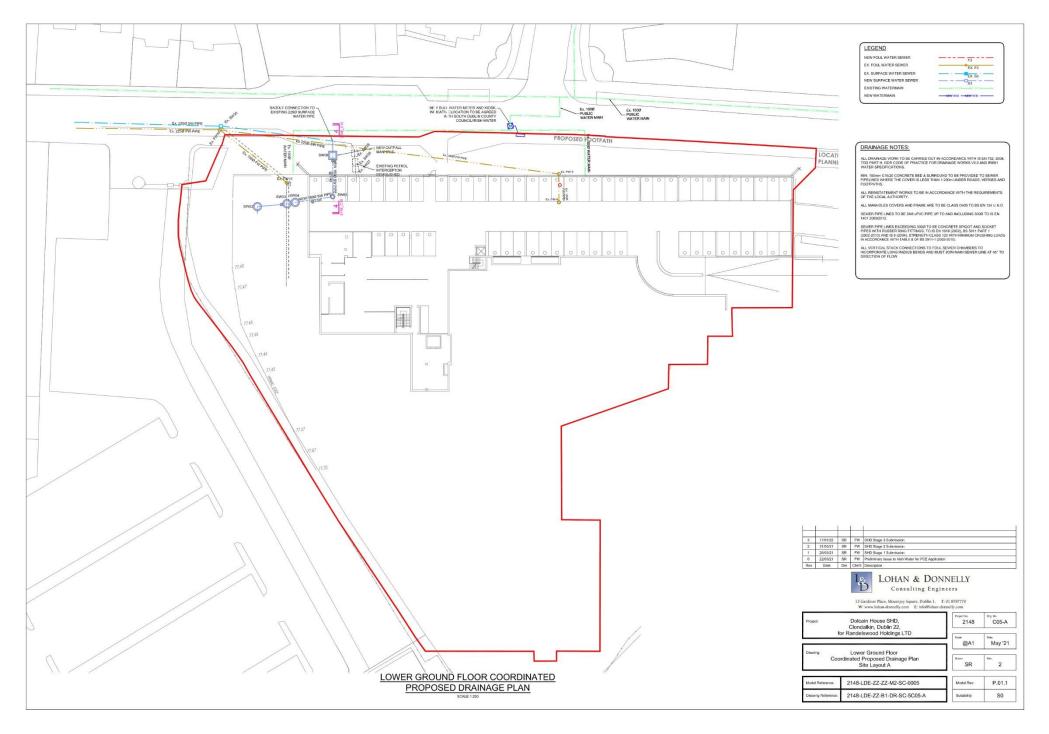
Proposed drainage plan - lower ground floor (co-ordinated) – Option A
